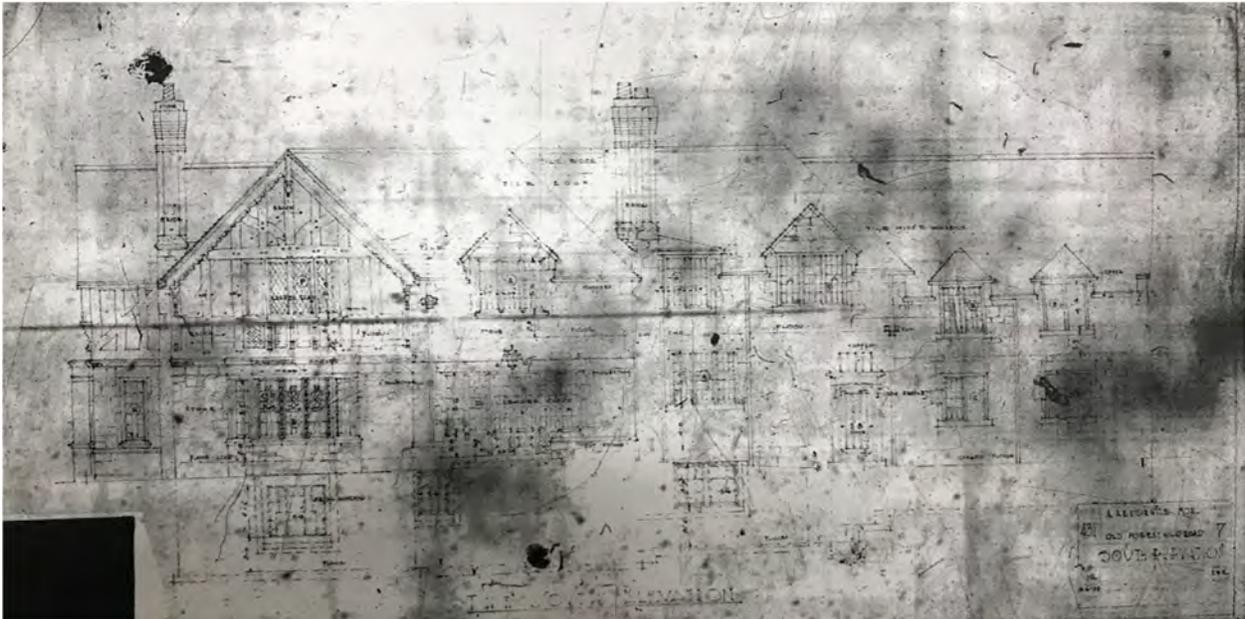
1934 architectural drawing by Douglas Kertland, showing the south elevation. (Building Records)
